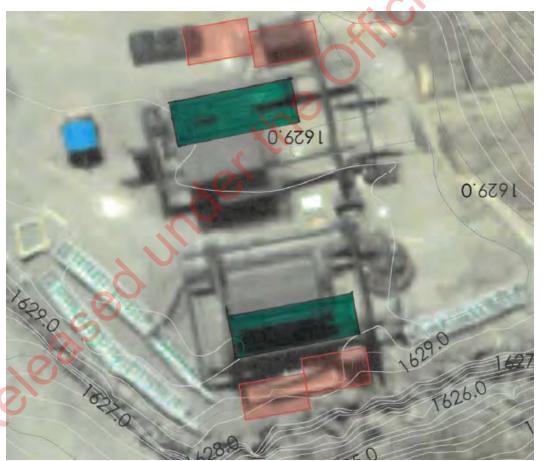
Load decks to be constructed in Green, adjacent to the load cabins
